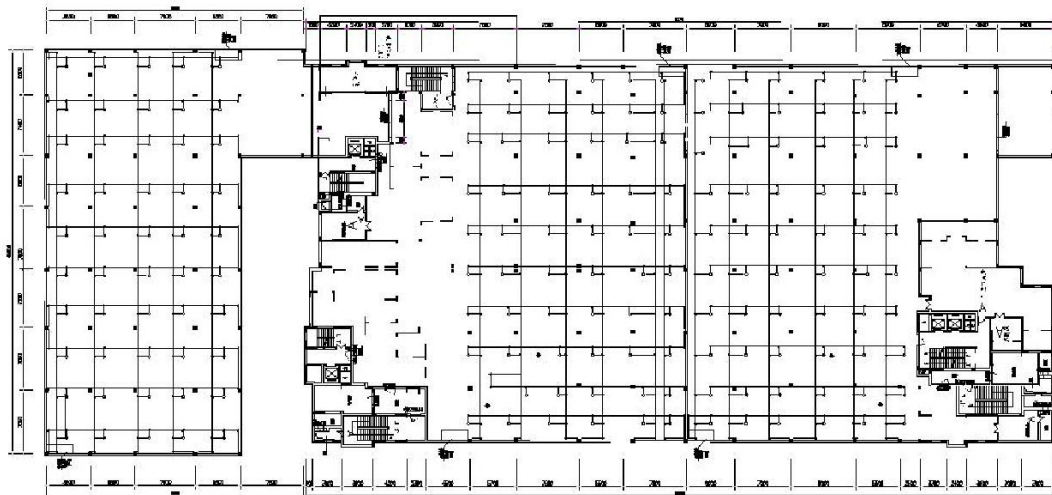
Floorplan for heat transfer drilling about Nanping garden in Hefei City[126]
